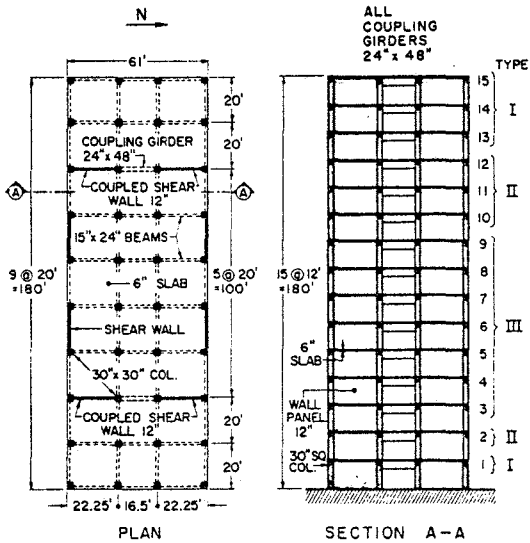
STRUCTURAL LAYOUT OF 15-STORY R/C FRAME-COUPLED WALL BUILDING
